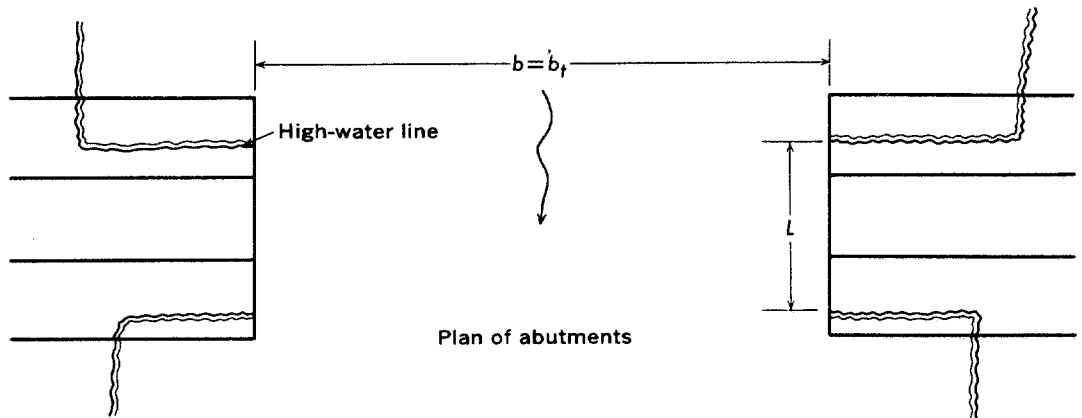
Definition sketch of type 2 opening, sloping embankments without wingwalls (after Matthai).
